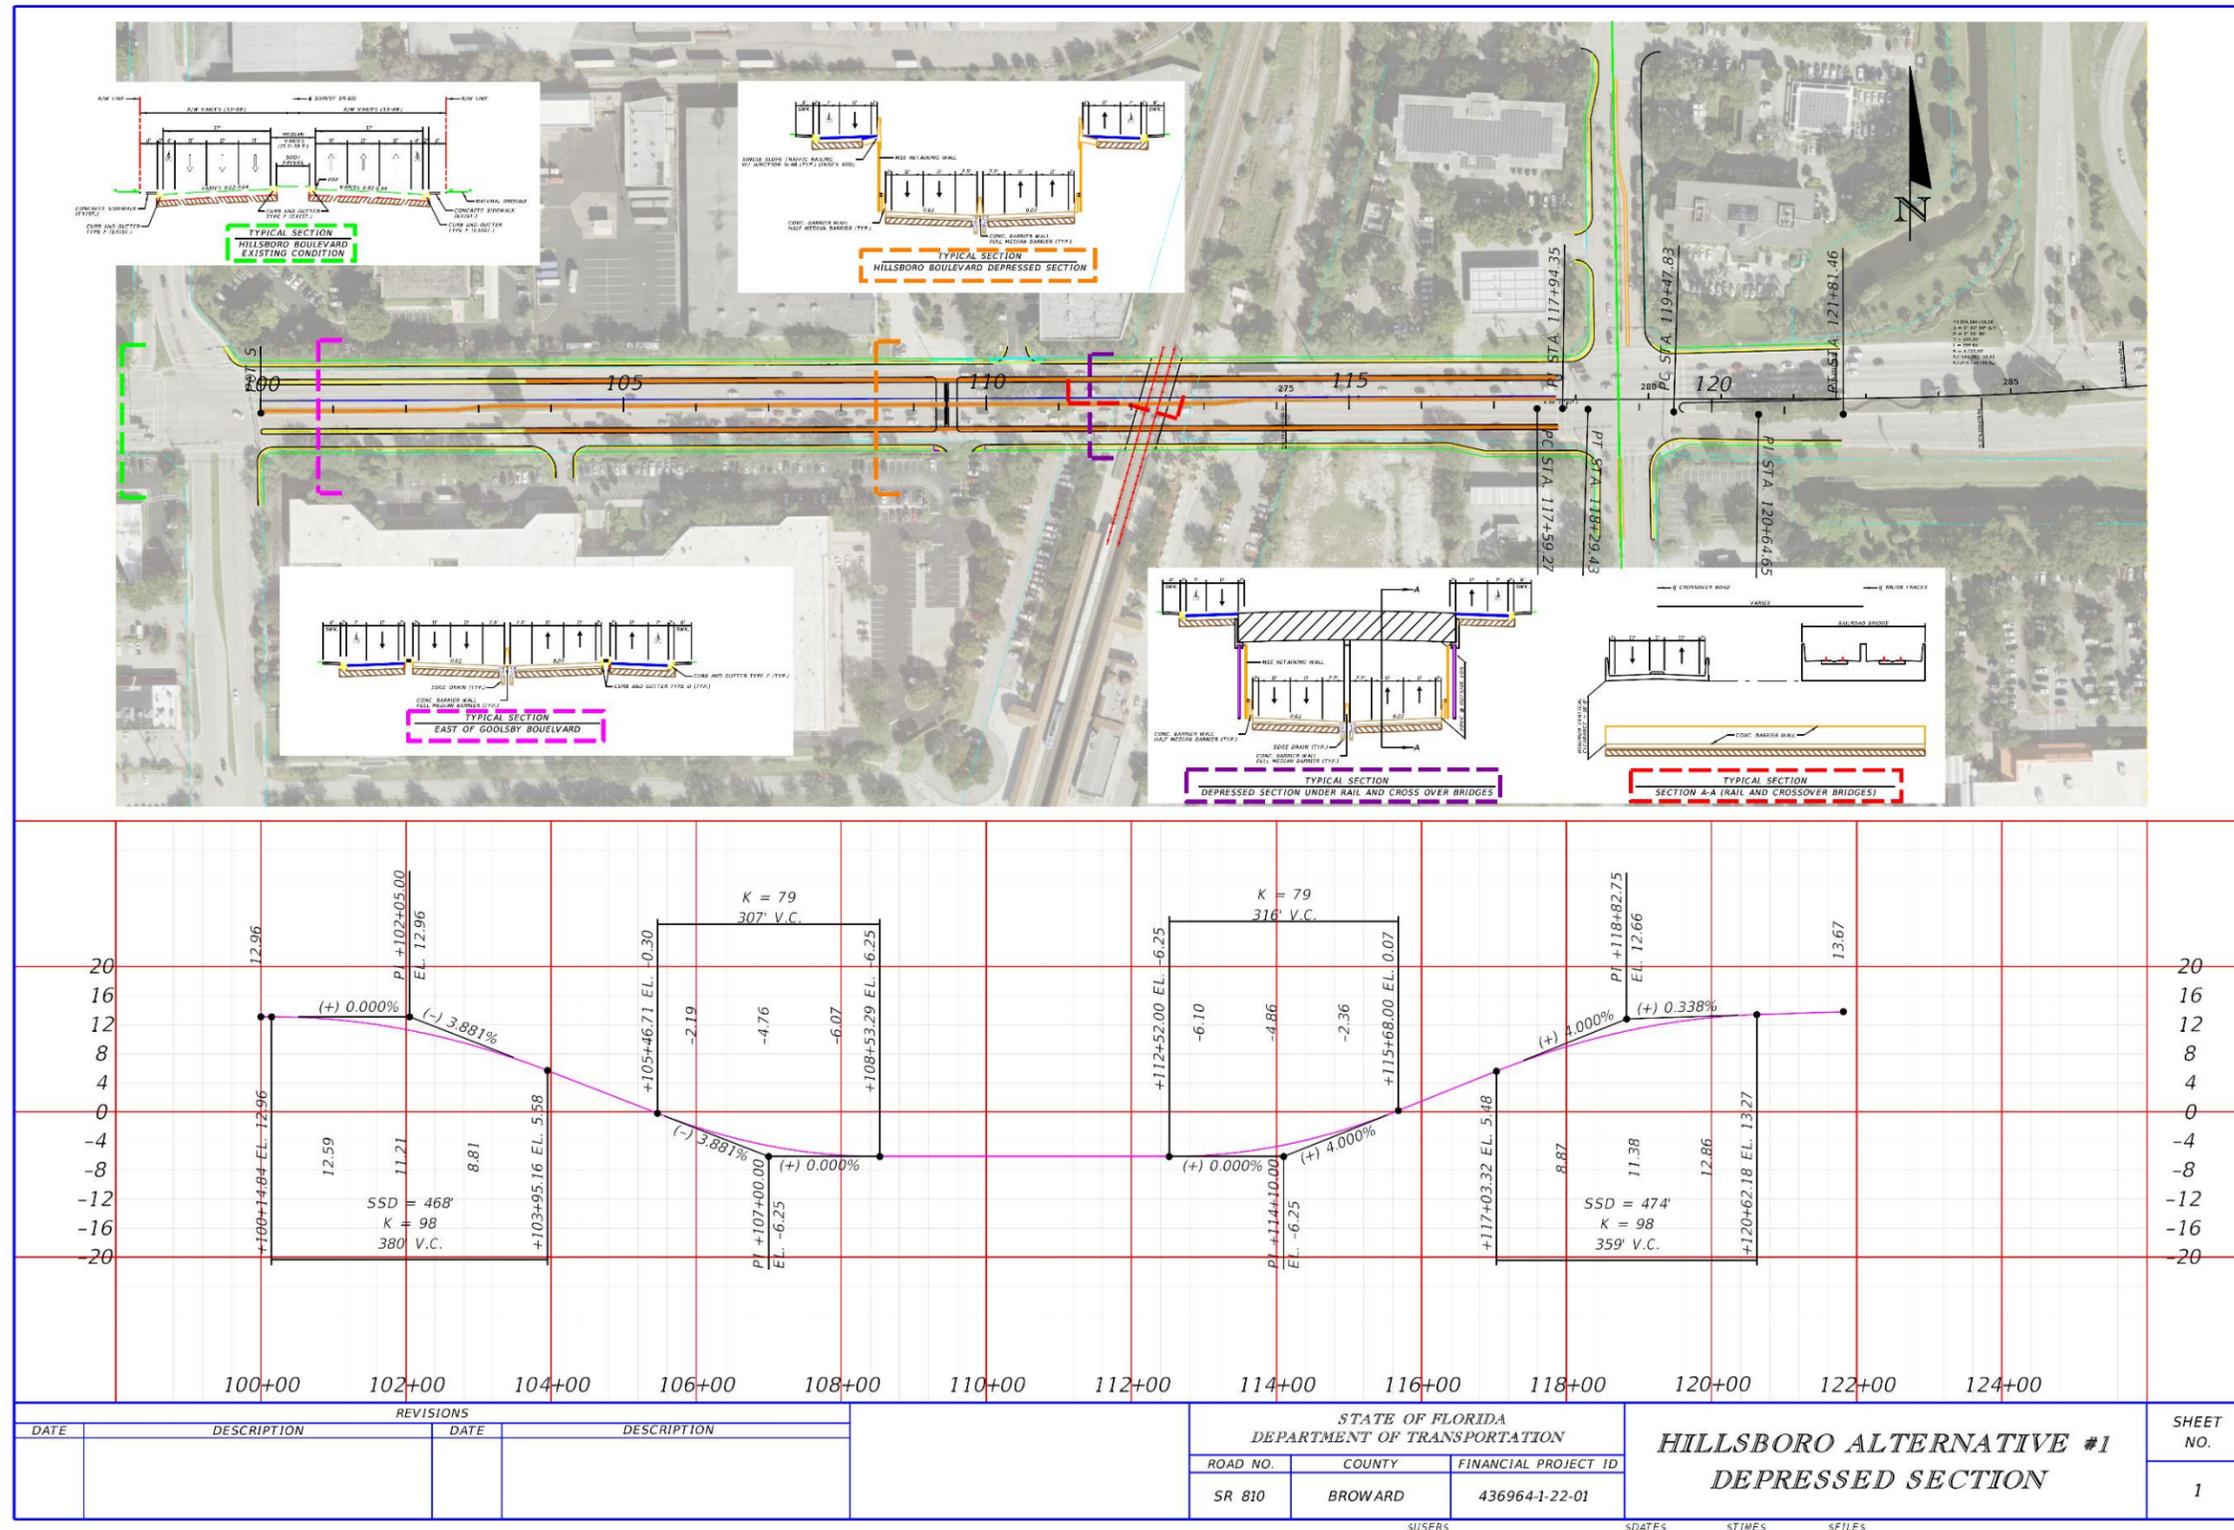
Hillsboro Boulevard – Concept Plan – Alternative 1
